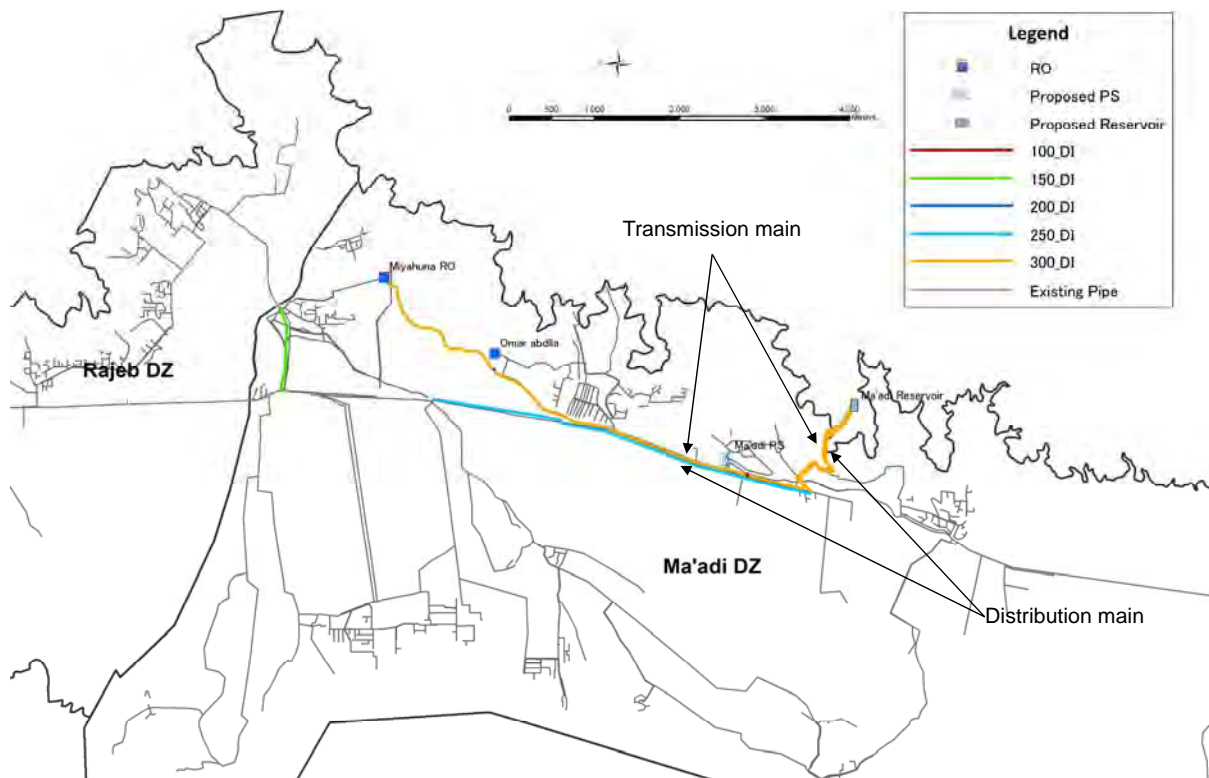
Arrangement of proposed pipeline routes and proposed facilities (Deir Alla)
